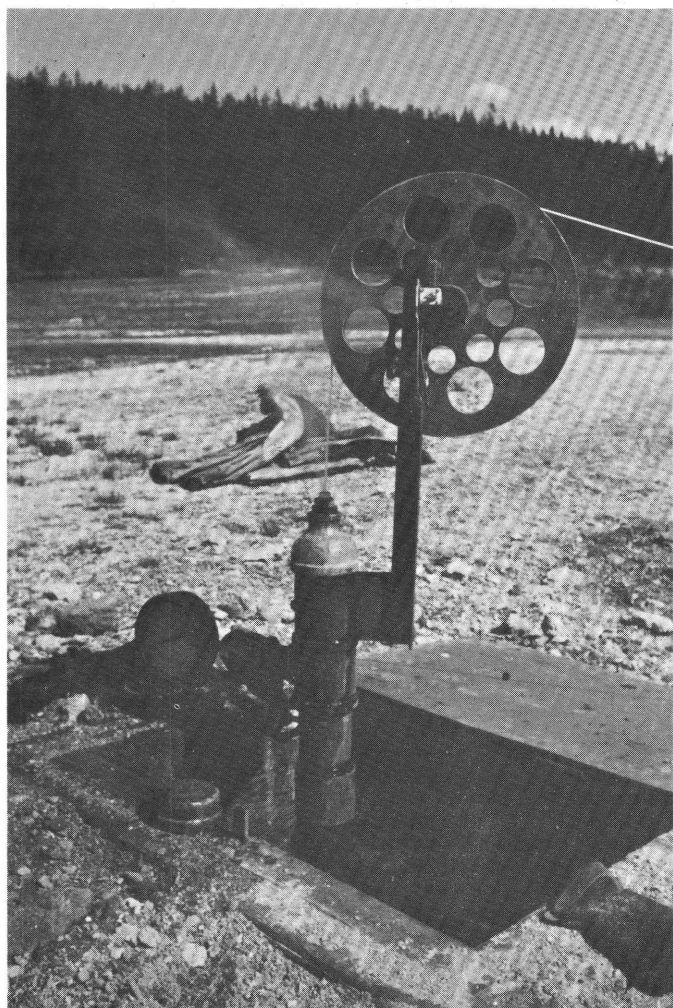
Typical arrangement at wellhead after completion, showing valve mounted at top of casing, concrete box (with steel lid) around the wellhead, and the gear used to introduce temperature-measuring equipment into the completed well. Y-8 drill hole, Upper Basin.
